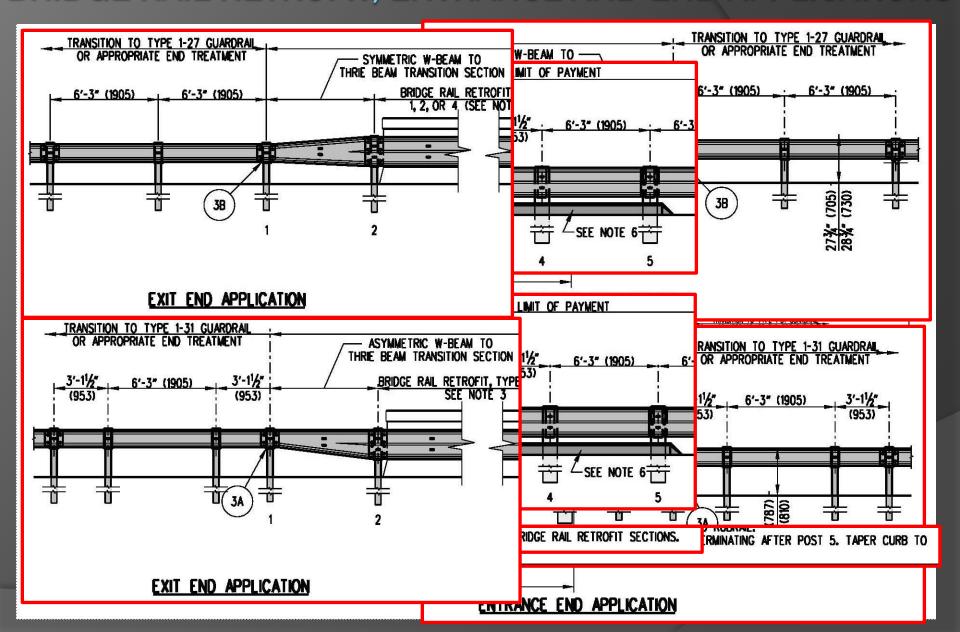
, SHEET 5 OF 6 GUARDRAIL TO BARRIER CONNECTION, TYPE 2 HARDWARE
